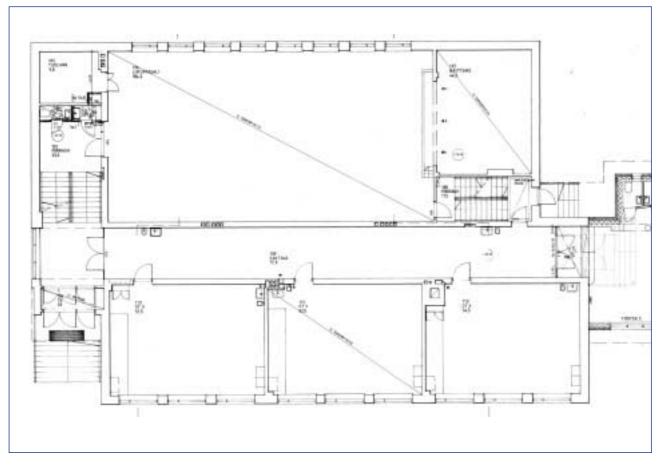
Floor plan: general layout of the 1st floor main building - gym and classrooms
